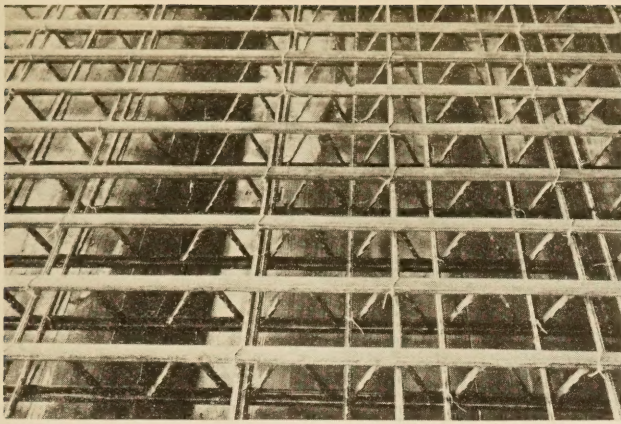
REINFORCING IN PLACE FOR TEST SLAB
